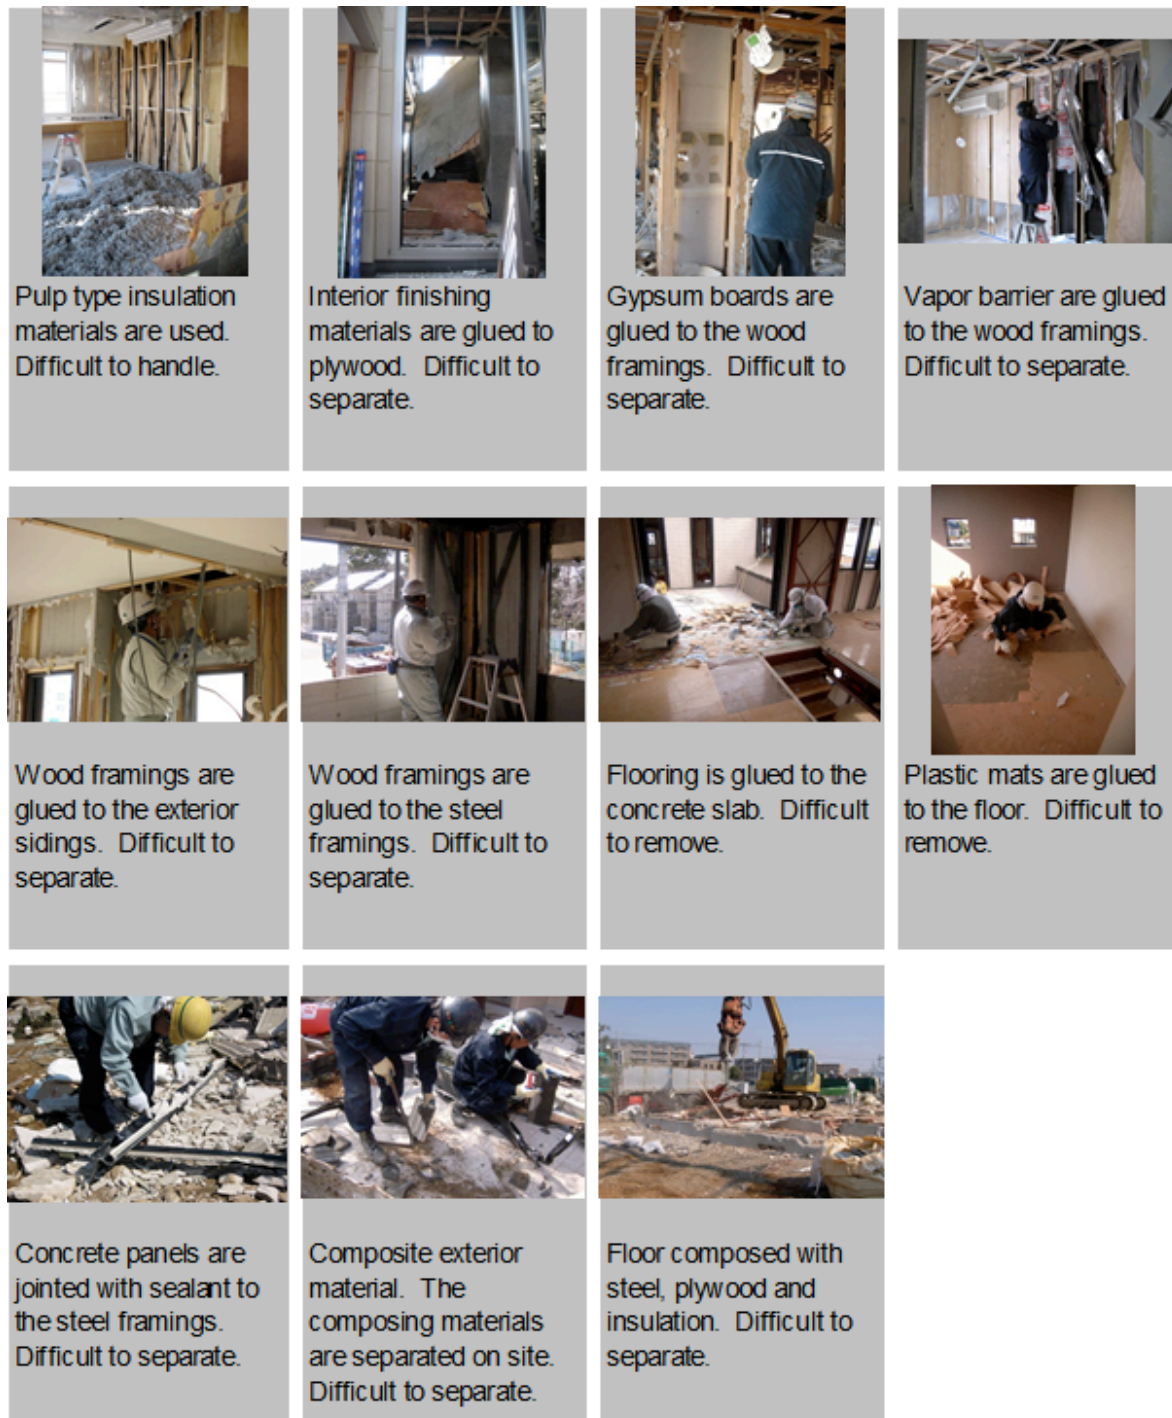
Examples of undesirable design for deconstruct or selective dismantle for light steel frame construction.
